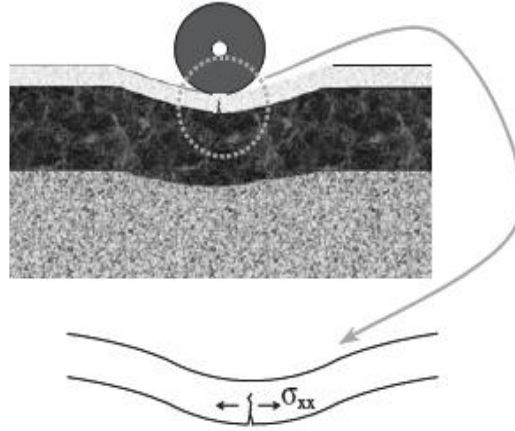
Mid-slab cracking mechanism of an UTW slab.
